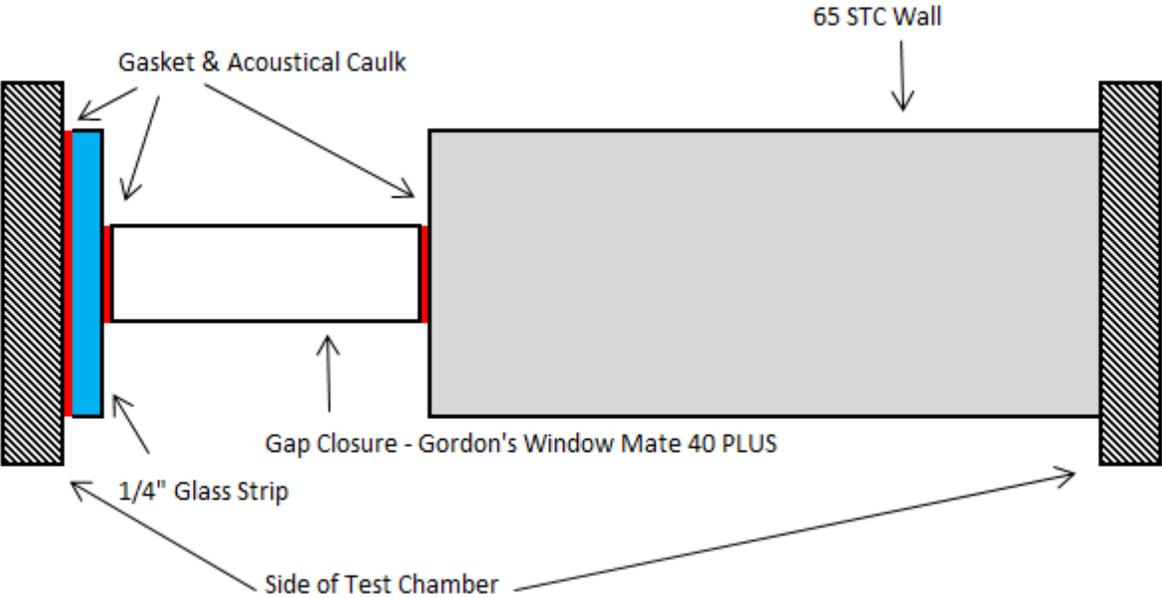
Section View of 65 STC Wall with Glass, Window Mullion, and Mullion Mate 40 PLUS
